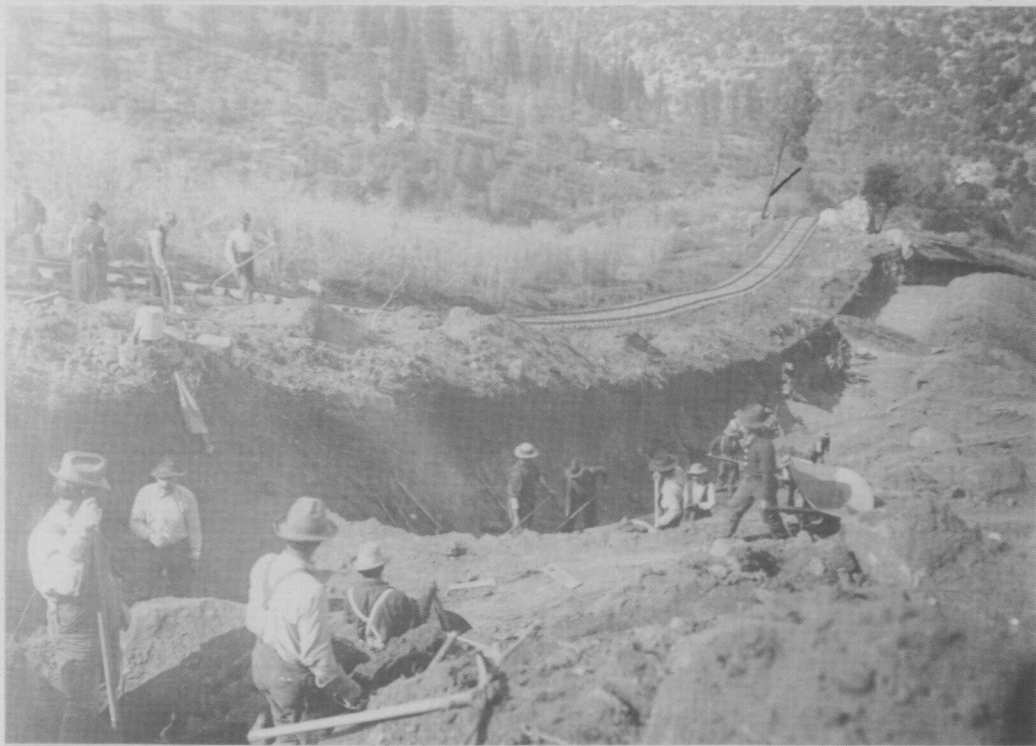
Hand excavation on the penstock line, 1913 (SCE var. [b]:Album 23, No. 252).
